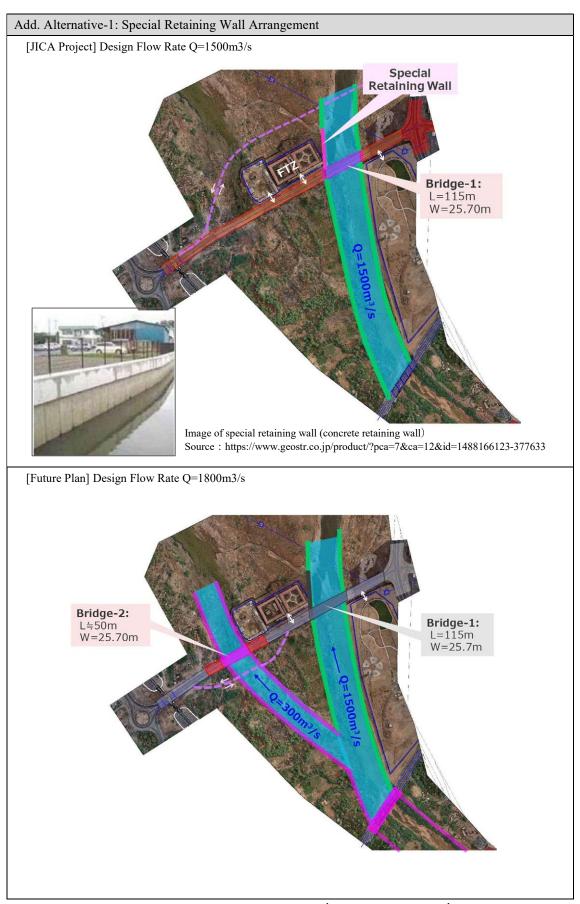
Outline of Plan (Add. Alternative-1)
